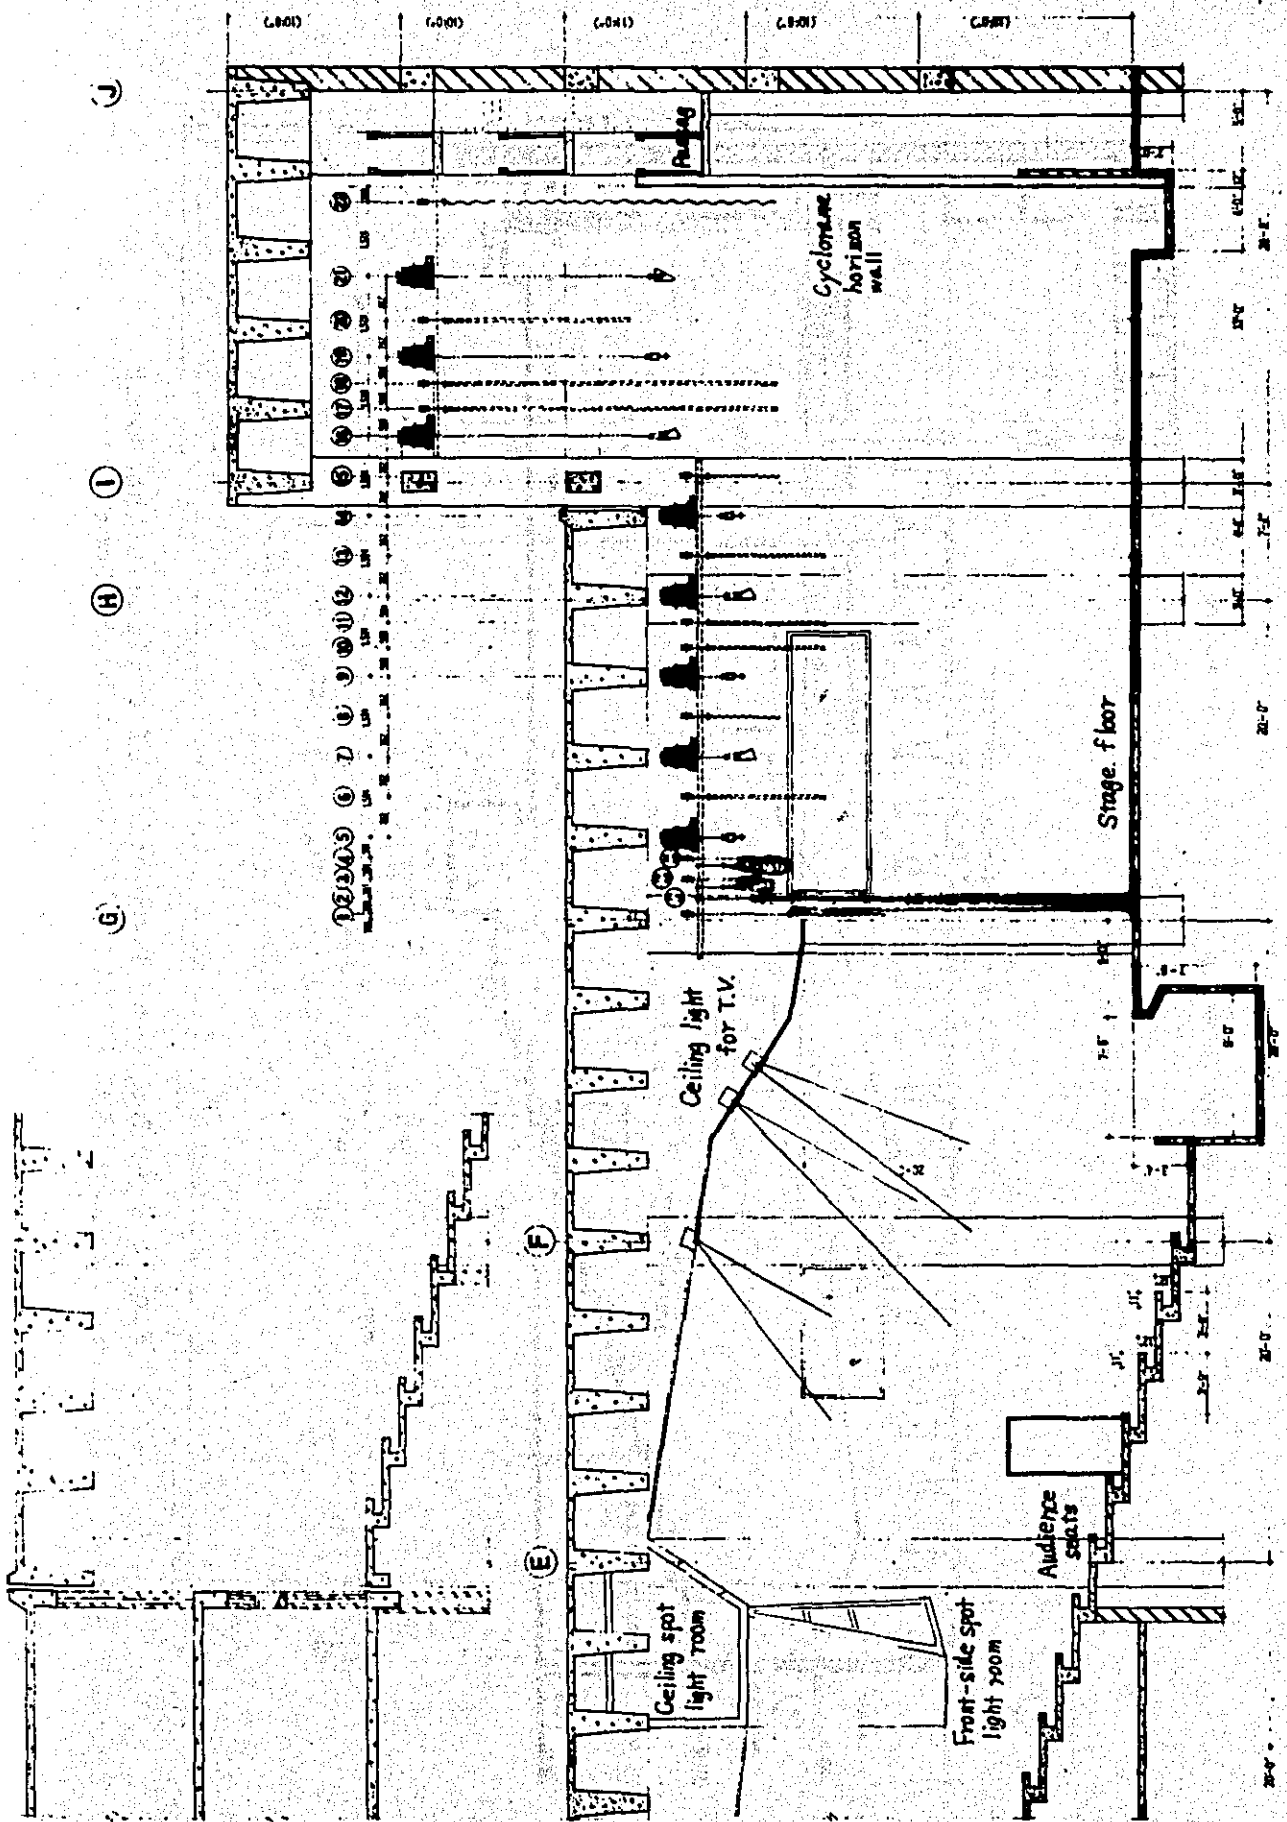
Cross-Sectional View of Arrangement of Lighting and Art Facilities
